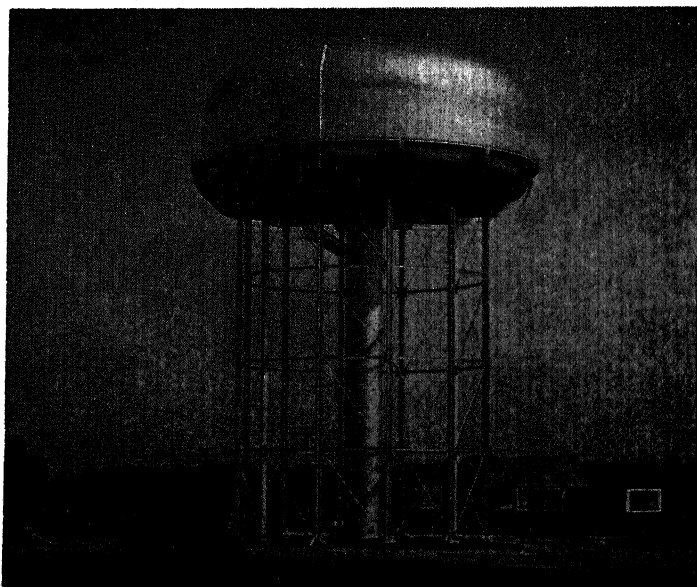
Radial cone design elevated water tank of 1½ million gallon capacity of welded steel construction. Total height 103 ft. 6 in.
